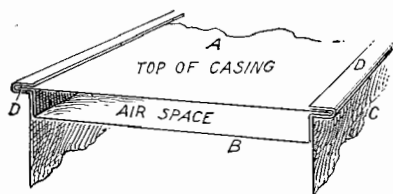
Constructing Top of Casing with Double Walls, Giving Air Space
